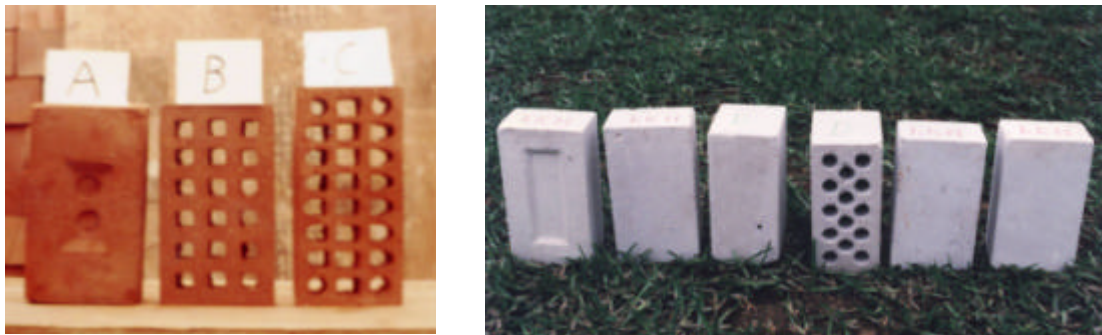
Typical Clay (left) and Silica Lime (right) Bricks in Peru
